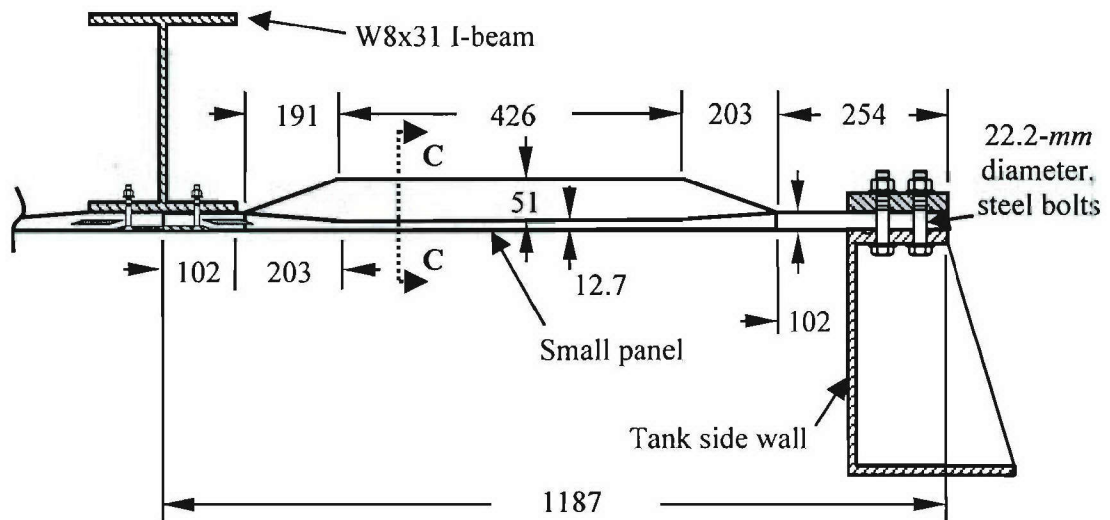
Geometry of the Small Panels - P01, Cross-Sectional View (in mm)
